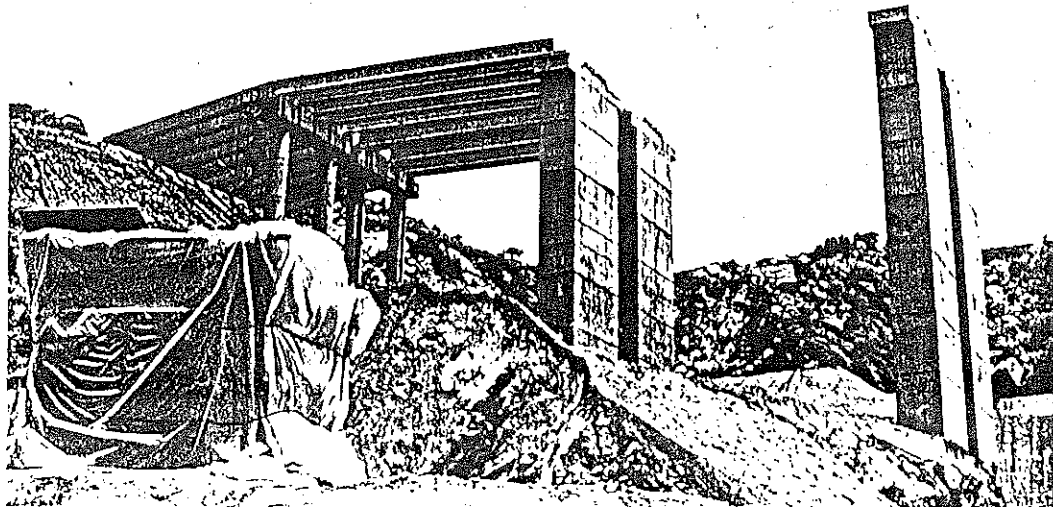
GIRDERS ARE HOISTED ON THE PIERS
